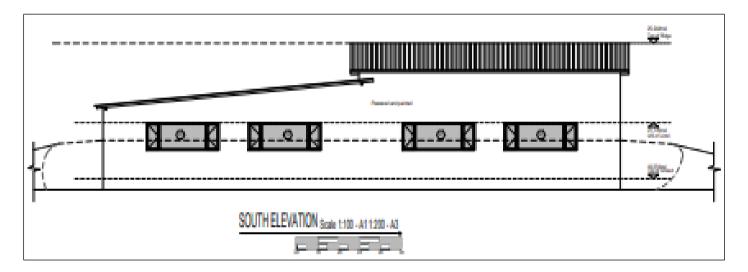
South elevation of the proposed new garages (TMBA, 2023)
